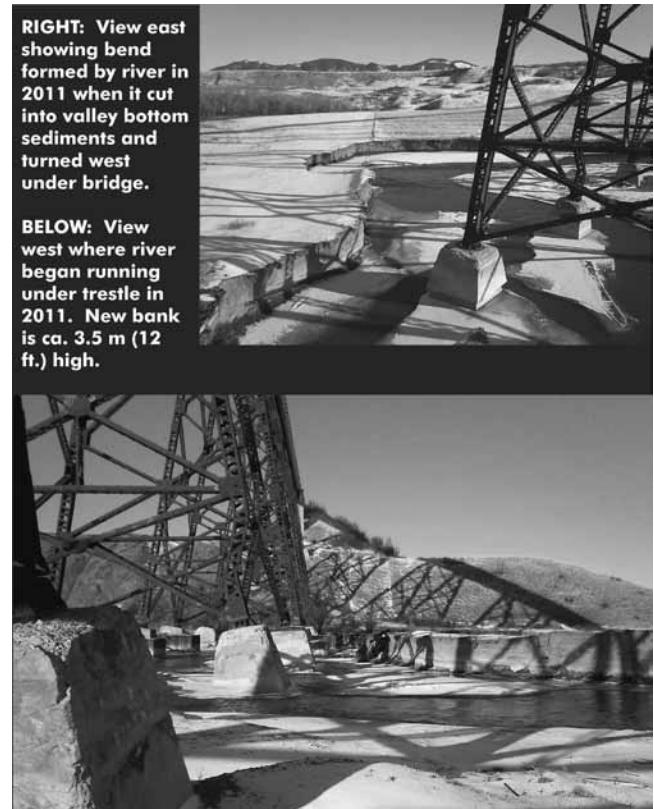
Formation of new river channel in May of 2011 resulted in scour that undermined piers and damaged the Central Montana Rail Bridge over the Judith River.
